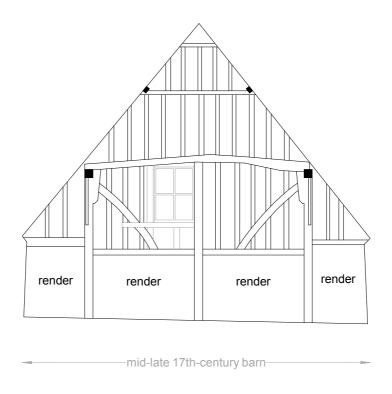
Structure 2 (17th-century aisled barn): timber-framing of west wall, with alterations shown grey.
